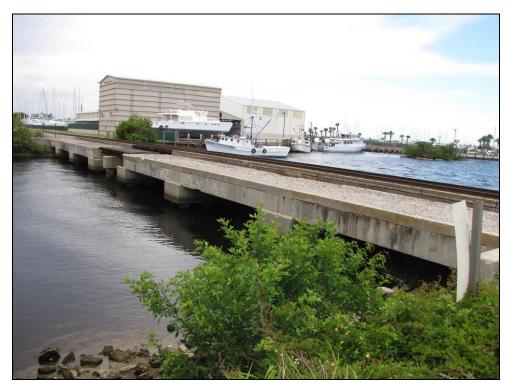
Fixed Bridge over the Taylor Creek (8SL3191), facing Northeast
